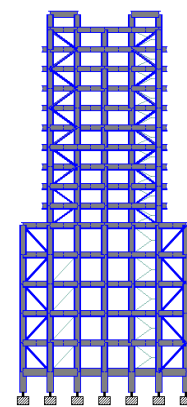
Elevation View of Proposed Structure M-III (X-Direction)
